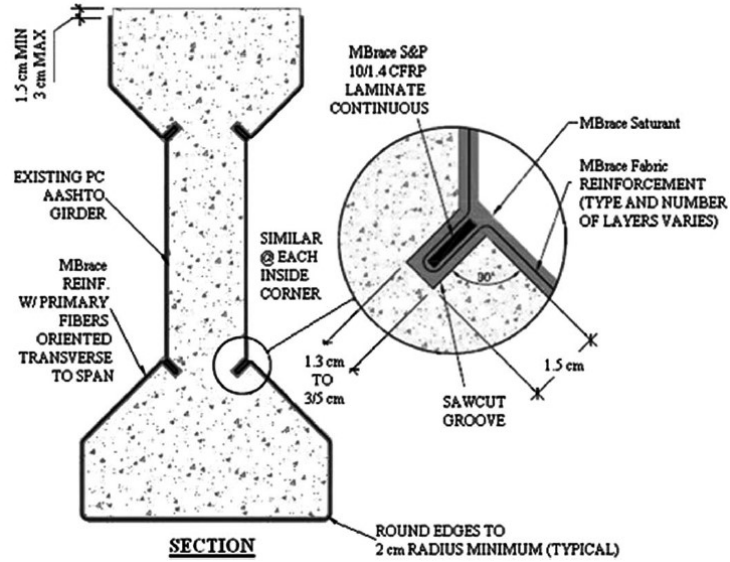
Embedded CFRP laminate anchorage system detail (from Petty et al., 2011).
